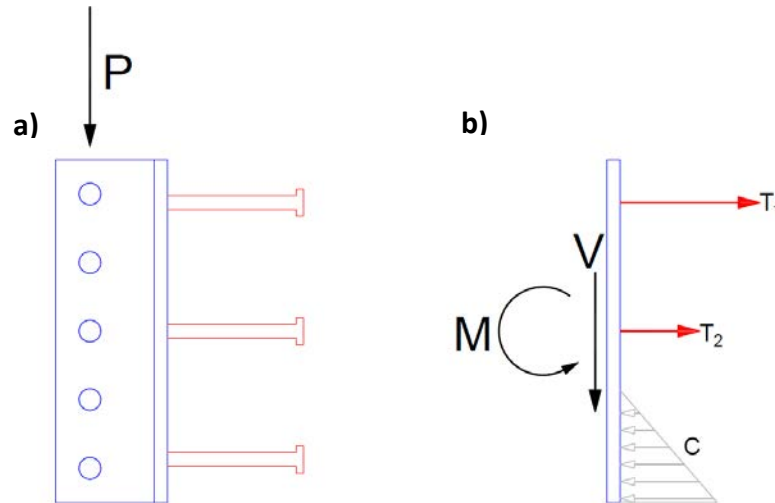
Assumed (a) shear load application and (b) resulting load distribution to anchors and concrete
